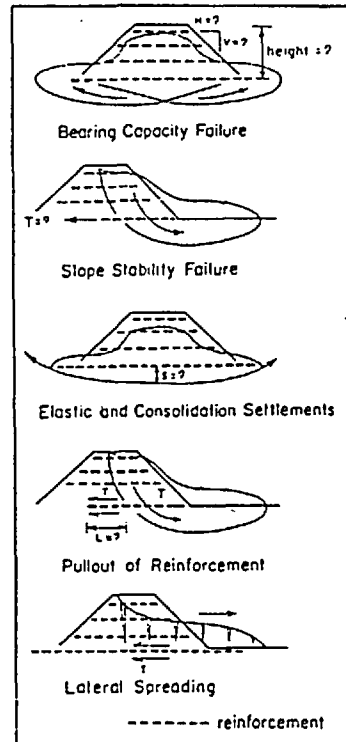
Design of mechanically stabilized embankment on soft ground.
